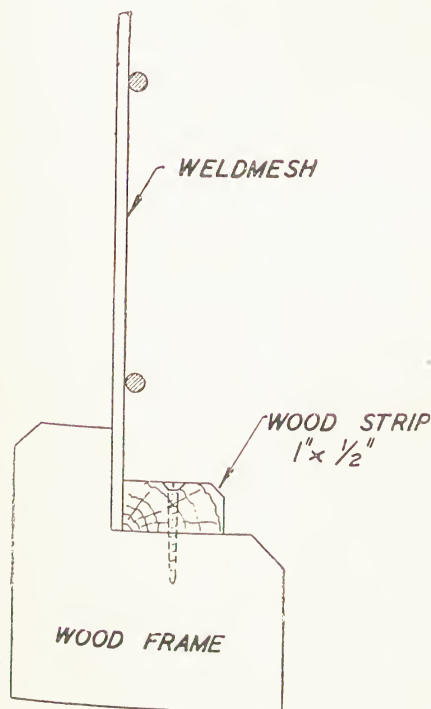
Fixing "*Weldmesh*" in wood frame.
